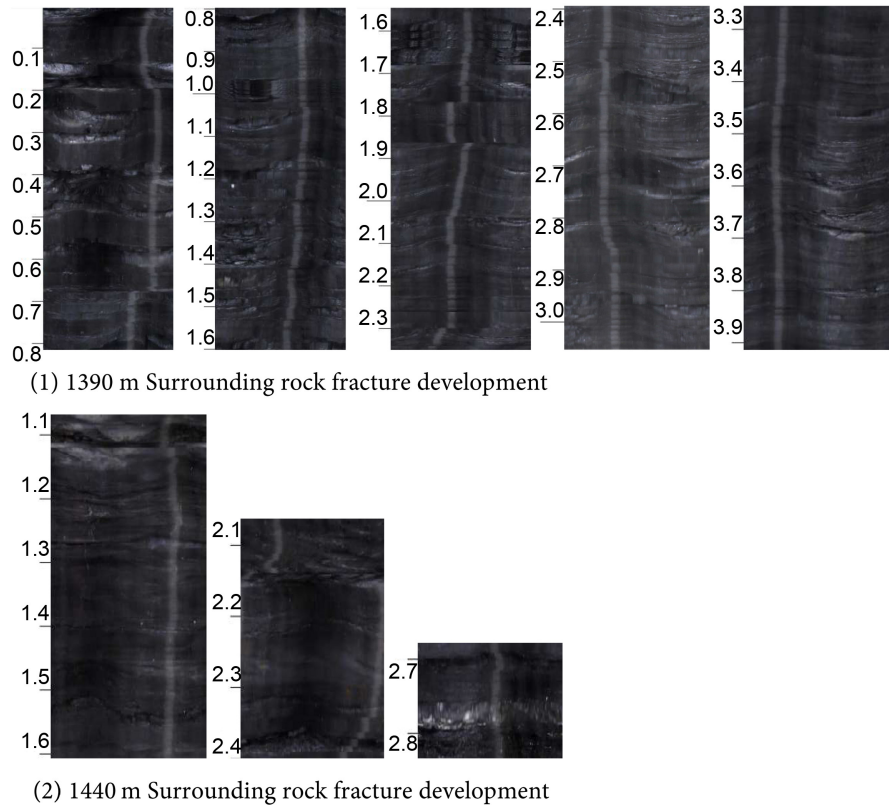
Tunnel 1105 surrounding rock crack borehole peek.
